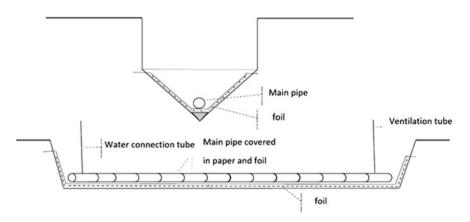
Technical overview of GRP drainage construction. Source Adapted from Korrmann (2014)
